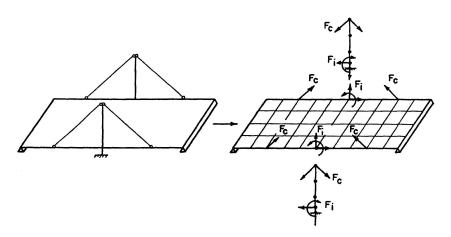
Typical bridge with finite element idealization and redundant forces.
